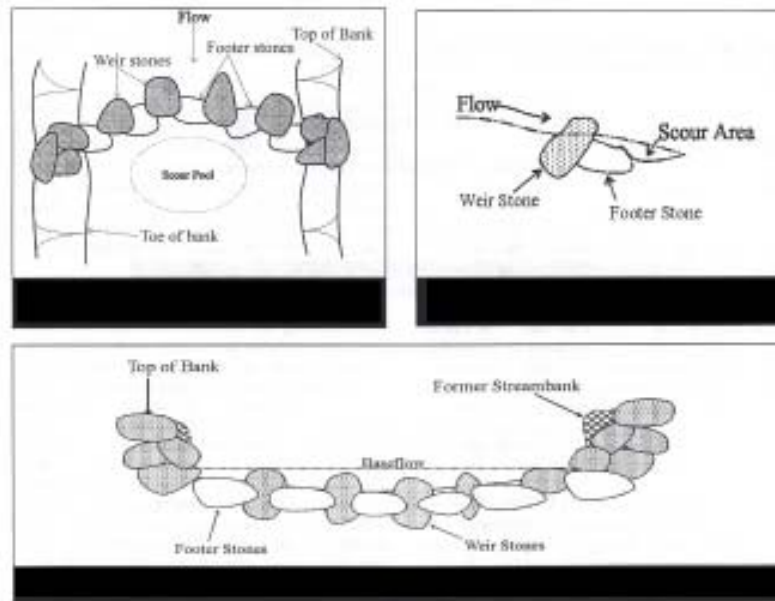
Sketches of plan, profile, and section views of a rock vortex weir (Source: Brown, 2000).
